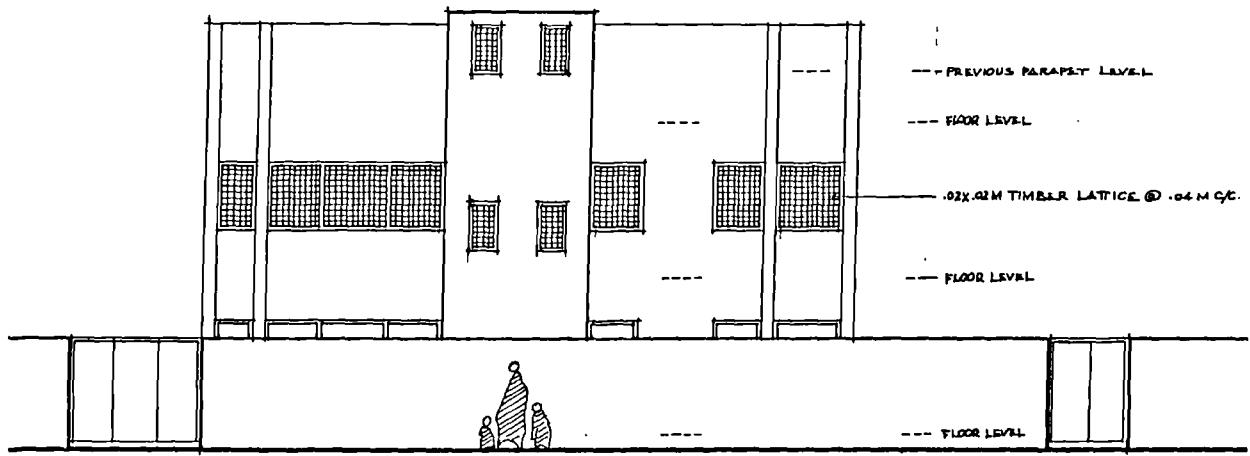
j): NORTH ELEVATION (after modulation).
